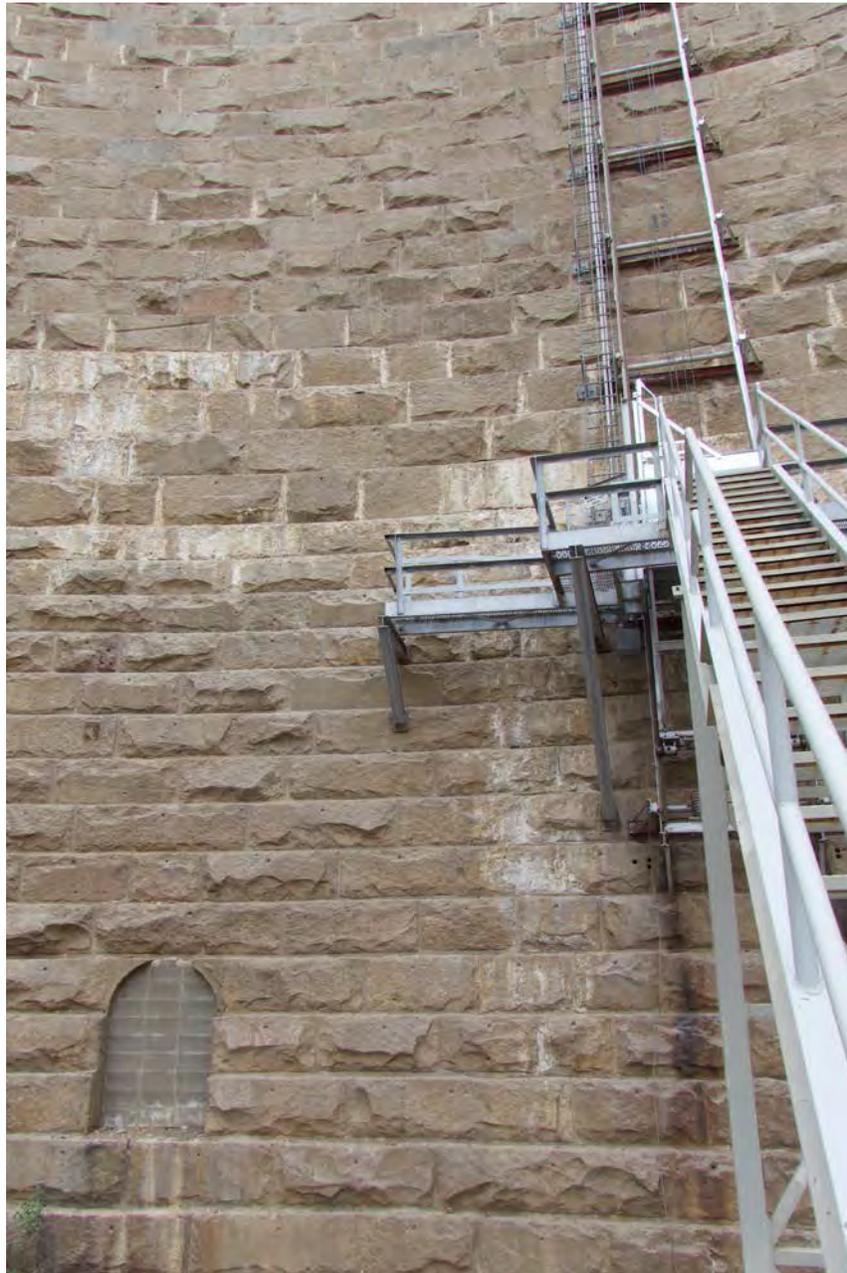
Stonework detail and plugged access gallery, downstream face Pathfinder Dam. Camera facing west.
